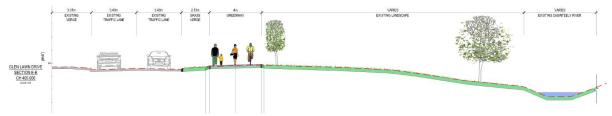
Cross Section for proposals on Cabinteely Greenway in Section B
